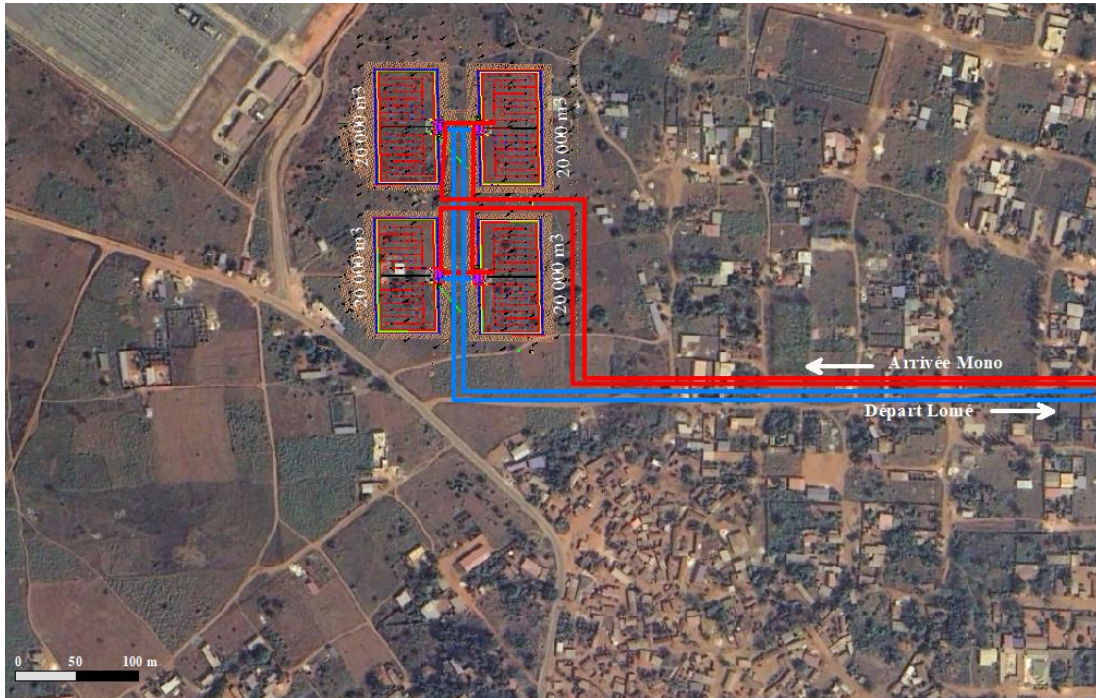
Projected installations - Kovié site (~15,000 m²)
